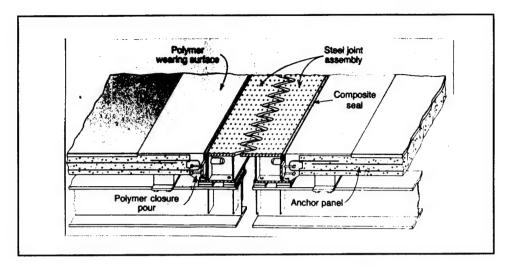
Steel expansion joint assembly, Woodrow Wilson Memorial Bridge (from ASCE 1984)
